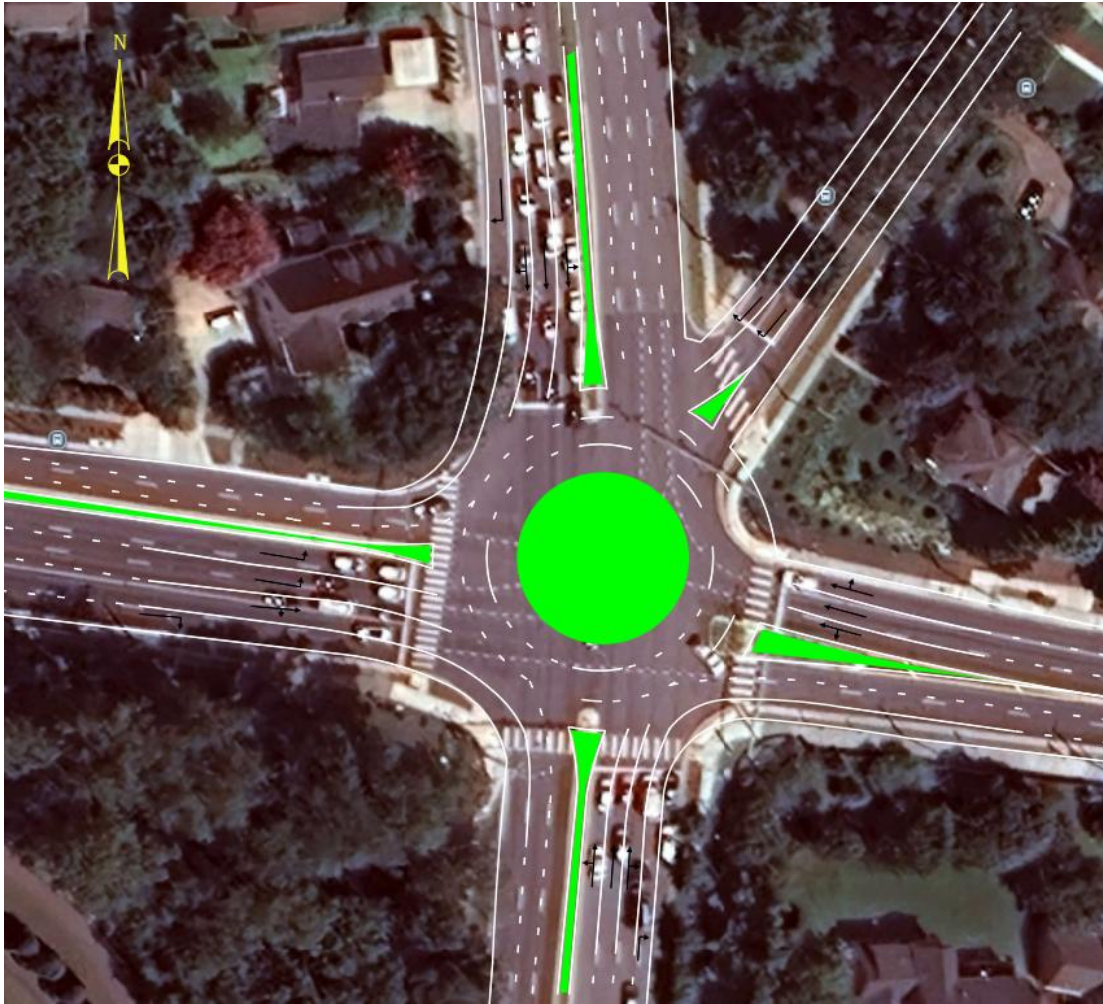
Alternative 7 – Three Lane Roundabout Concept Plan
